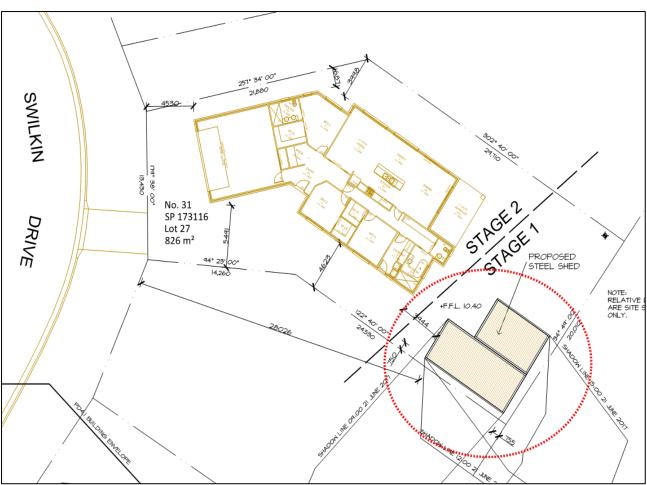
Copy of Site Plan submitted by applicant with location of outbuilding circled in_red
